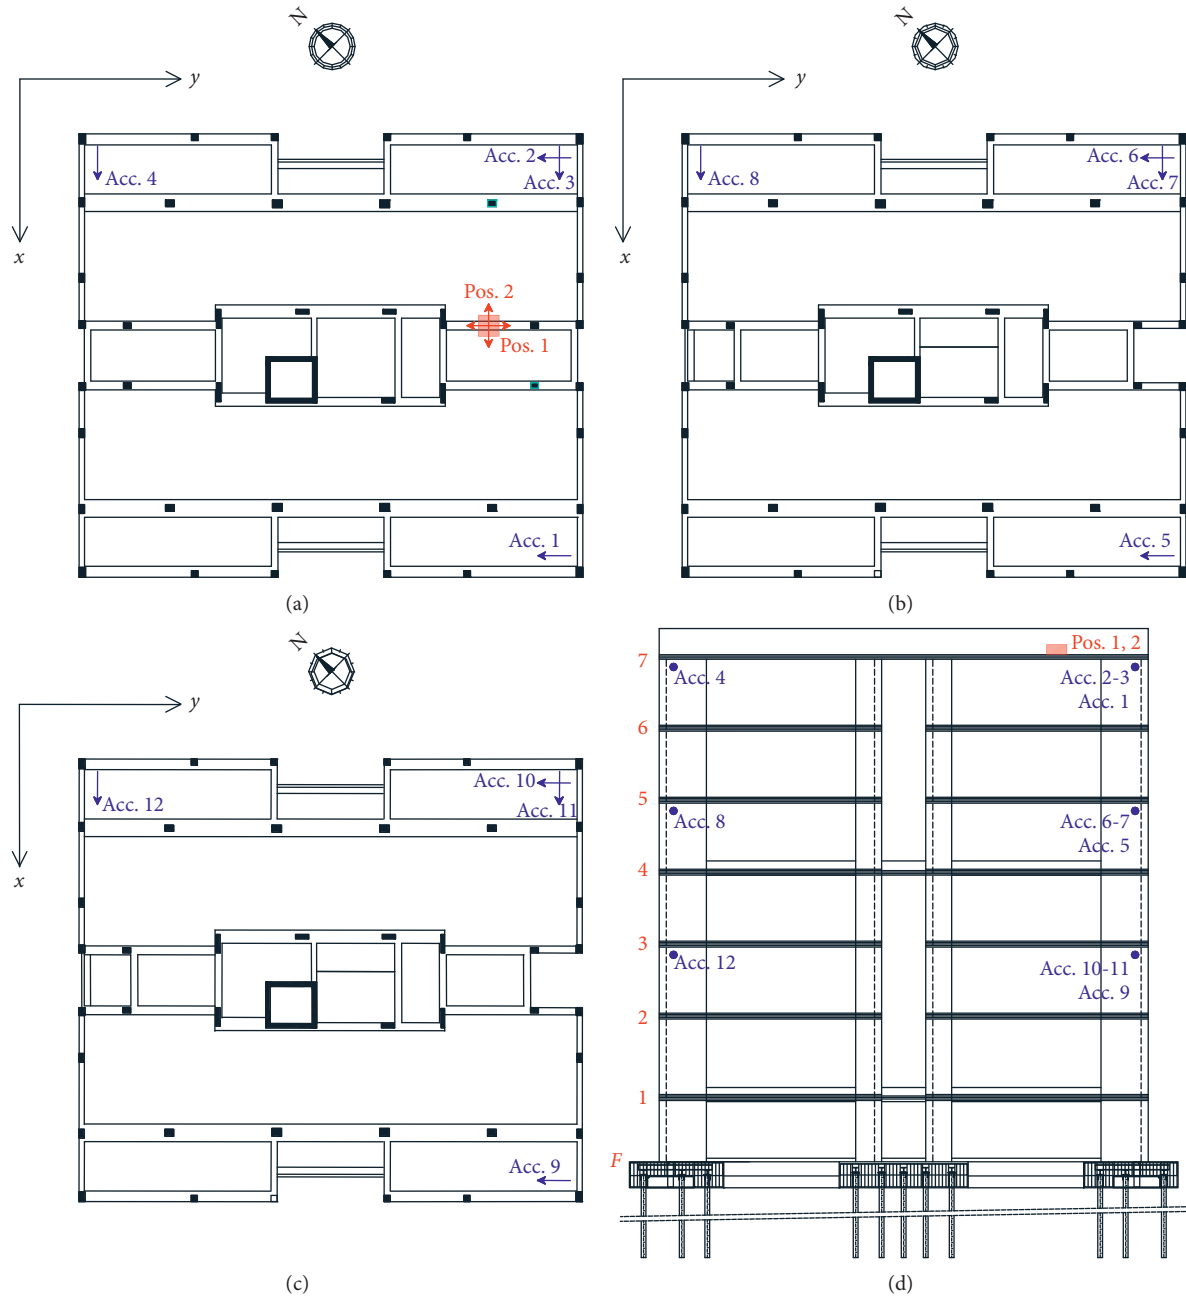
Positions of accelerometers and the vibration generator during the dynamic tests. (a) Plan view of floor #7 (roof floor); (b) plan view of floor #5; (c) plan view of floor #3; (d) vertical section of the building.
